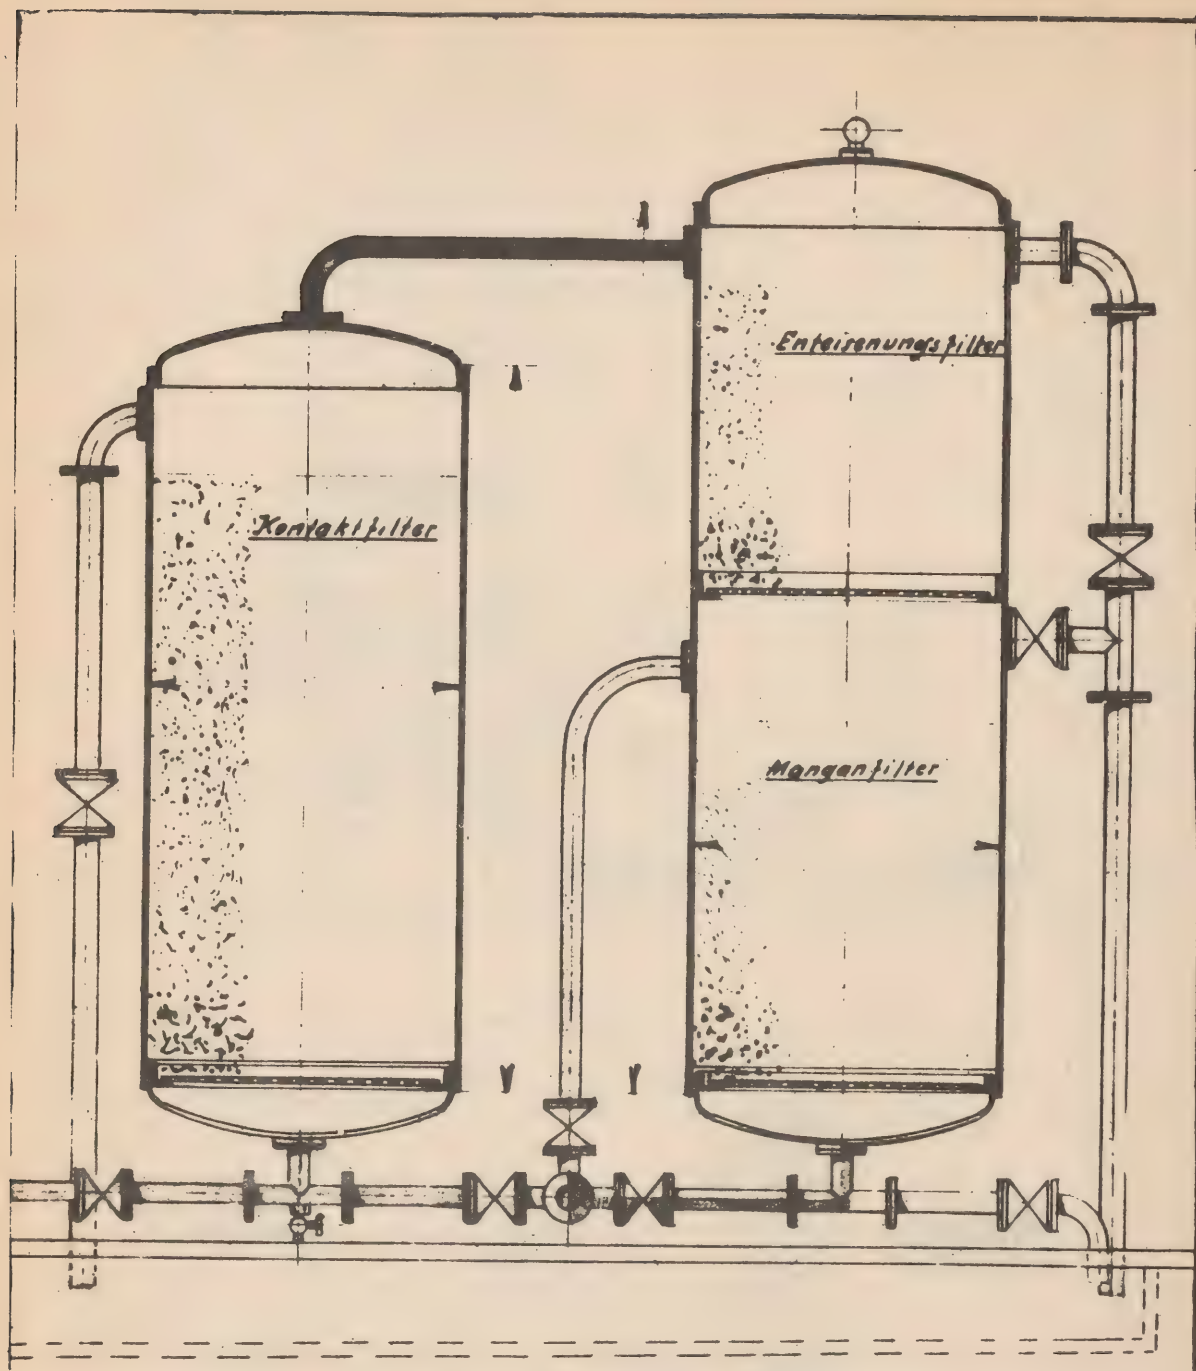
, iron and manganese removal pressure filter units with contact filter - Bamag.
